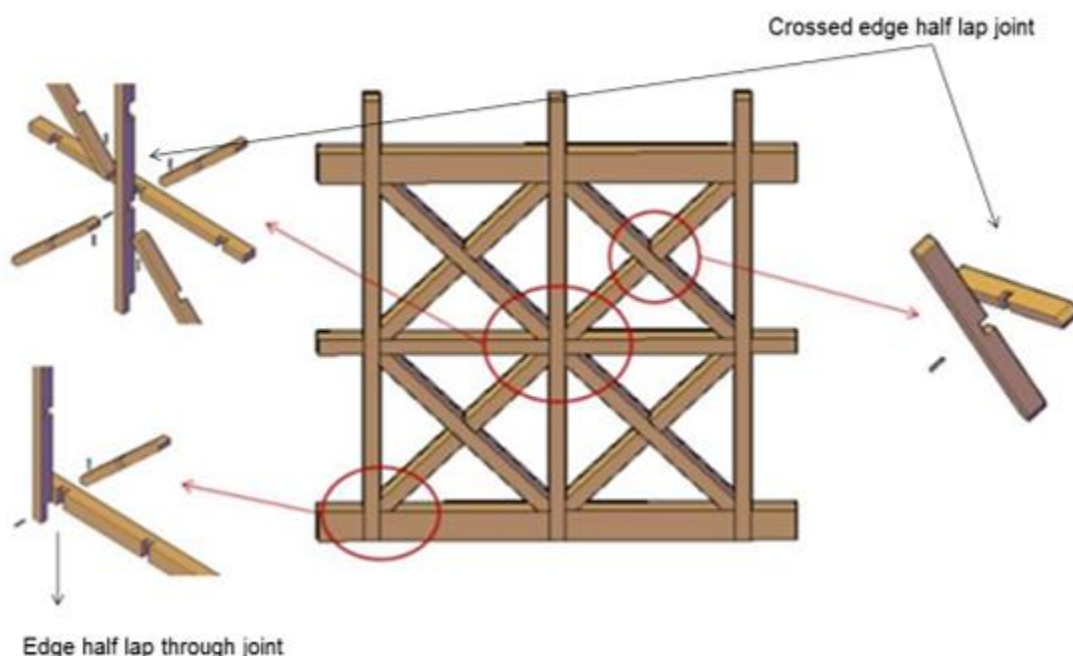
Configuration and structural details of the connections in the “Pombalino” structure [4], [14].
